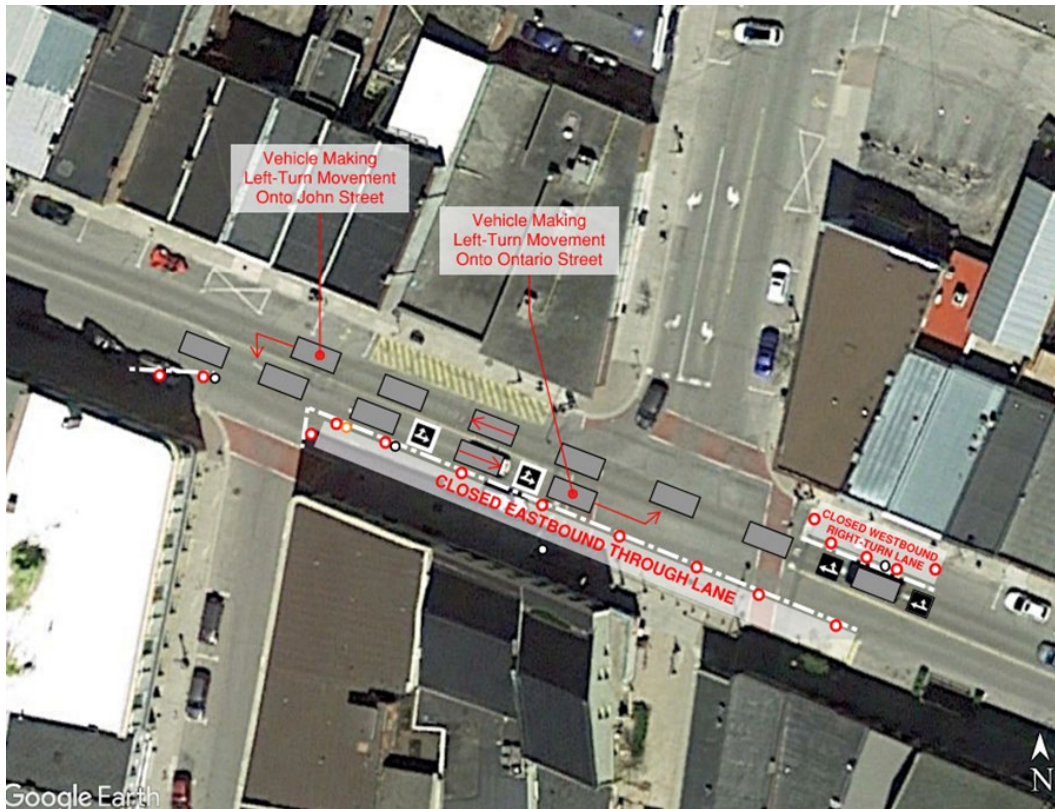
Schematic Plan View of Congestion Due to Left Turning Vehicles at John Street and Ontario Street
